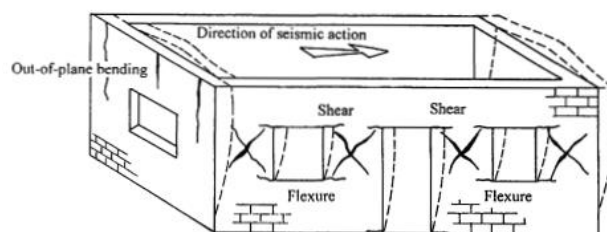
Deformation of a masonry building and typical damage to a structural wall (Tomazevevic, 1999)
